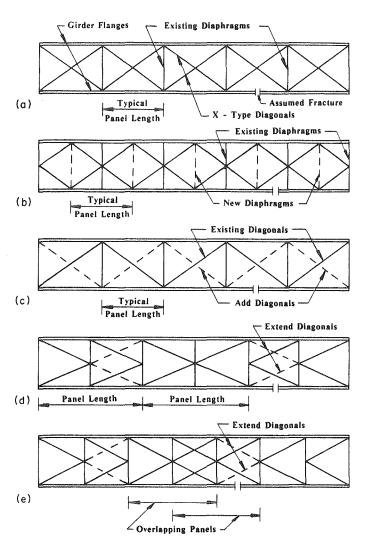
Examples of bottom lateral bracing configurations which can be retrofitted to X-type.
